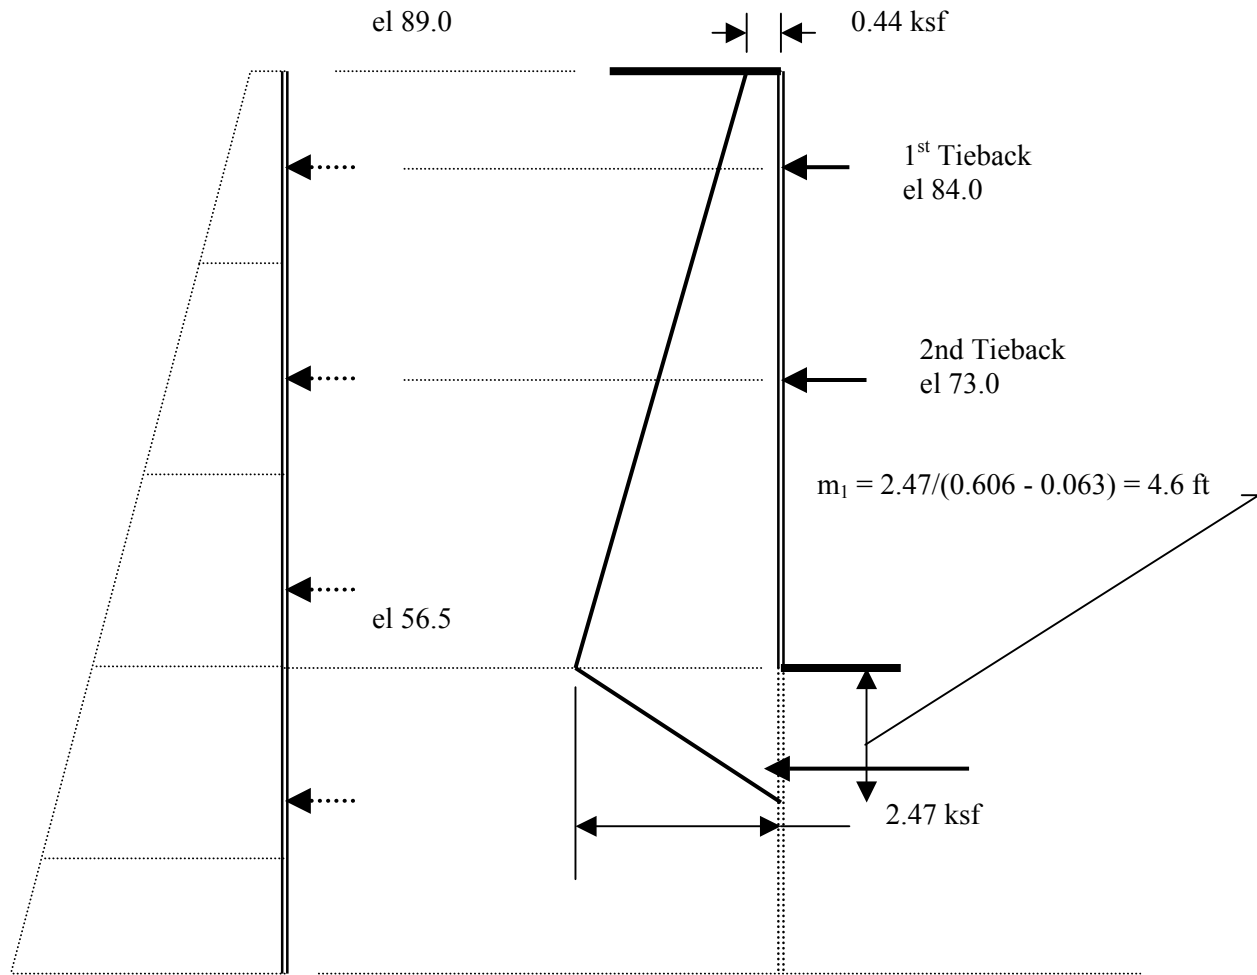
Step 8, excavate to el 56.5, third-stage excavation
